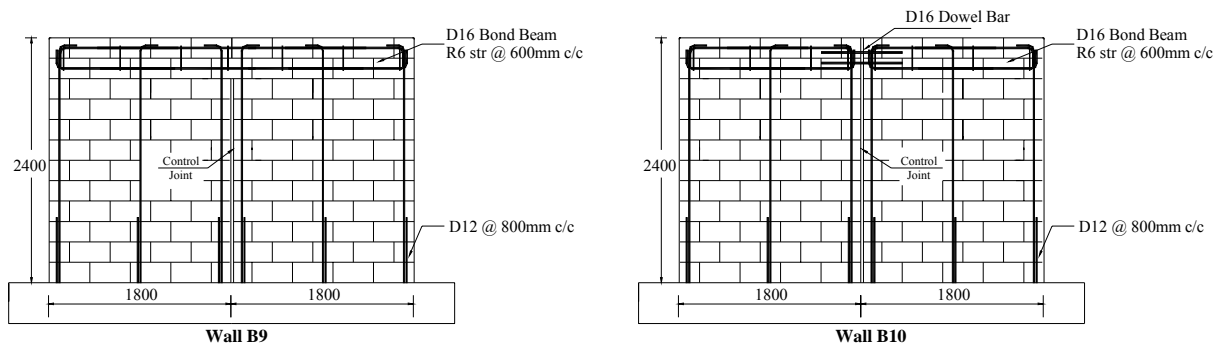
Series B - Wall geometries and reinforcing details (continued).
